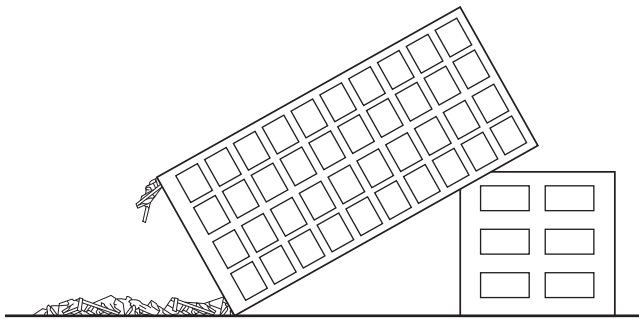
(e) Overturn Collapse Pattern — Heavy Floor or Heavy Steel Construction.
